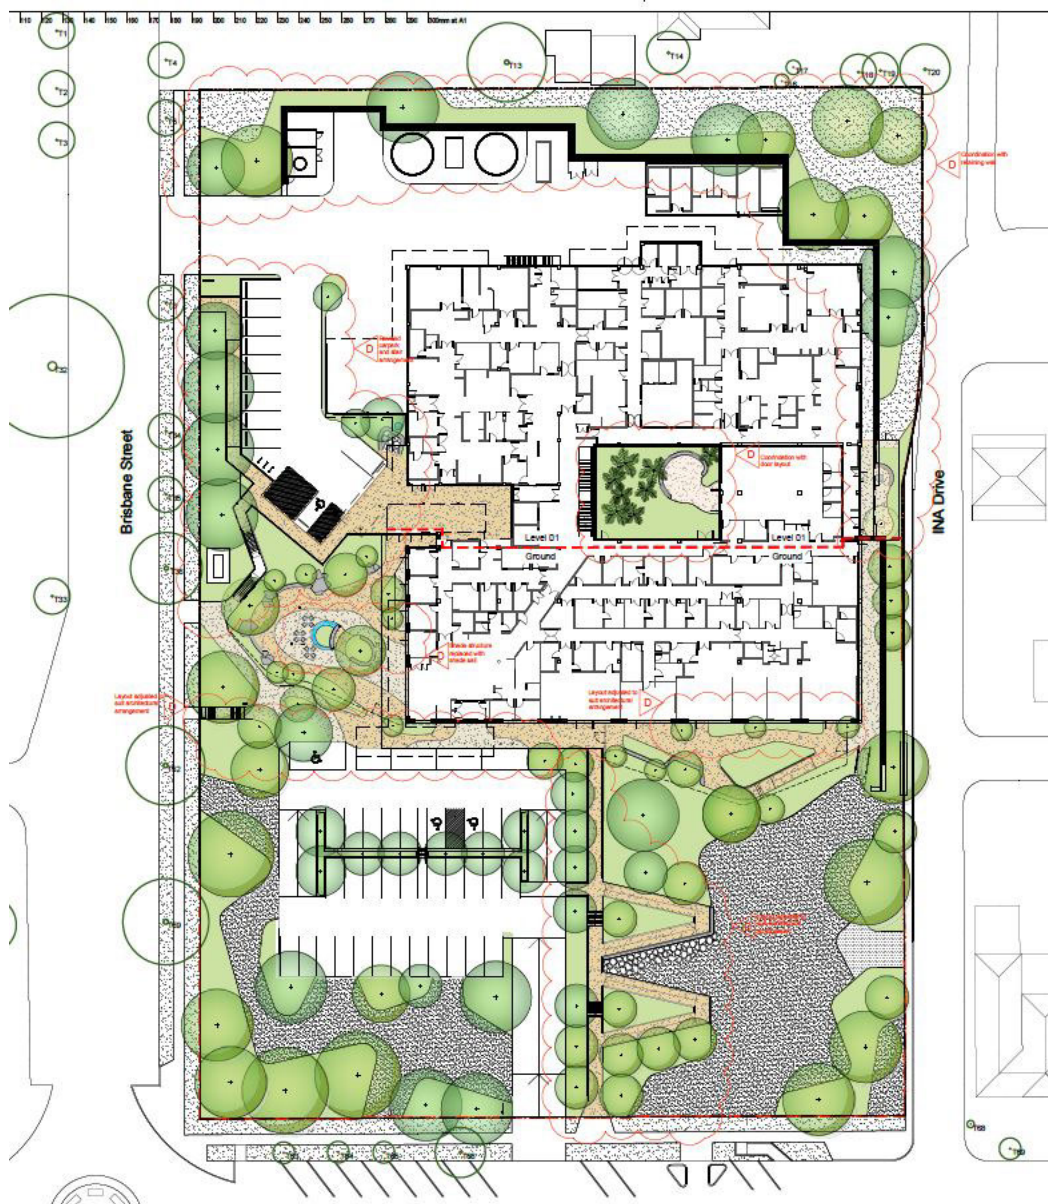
Proposed Landscape Plans (Source - Site Image Landscape Architects)
